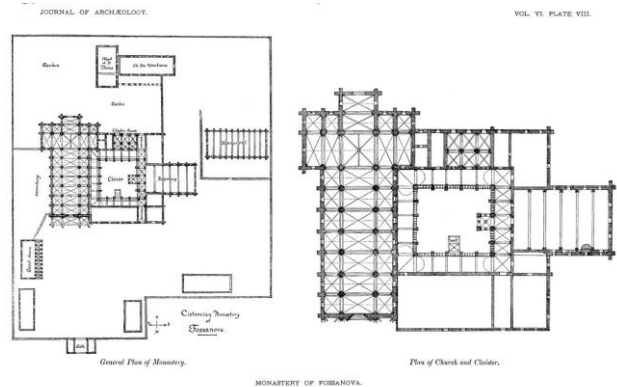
Abbey complex of Fossanova. Floor plan by A. L. Frothingham, 1890.
